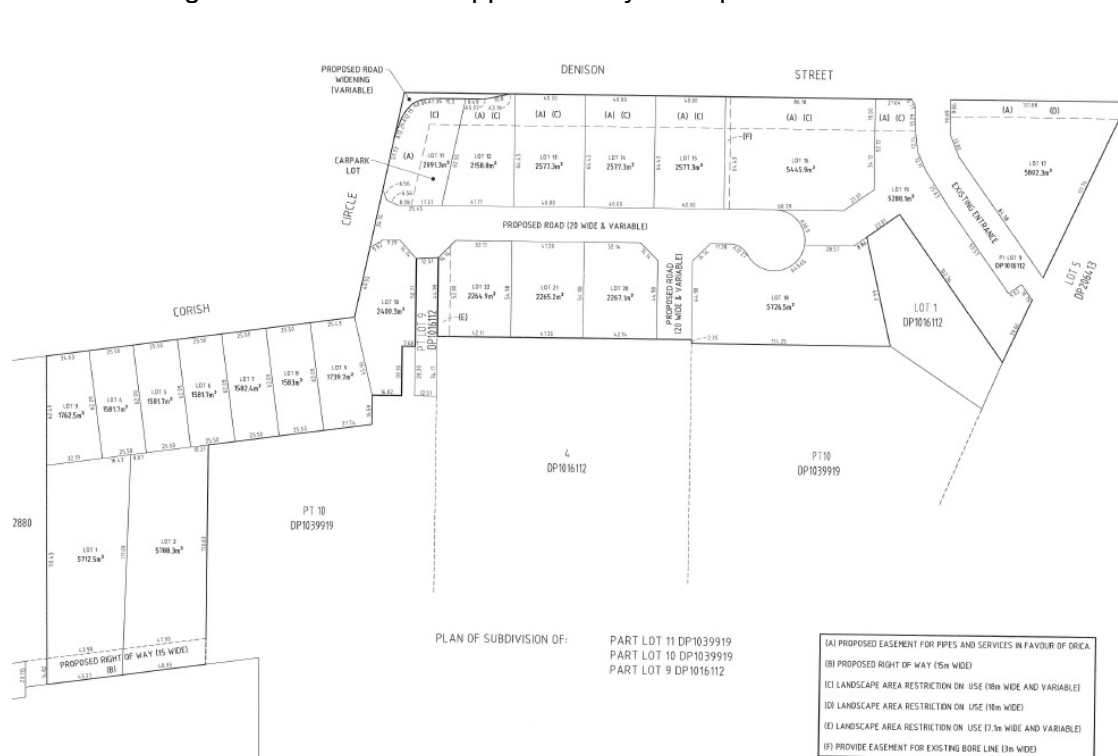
Approved Subdivision Plan with potential car parking lot indicated as Lot 11.
